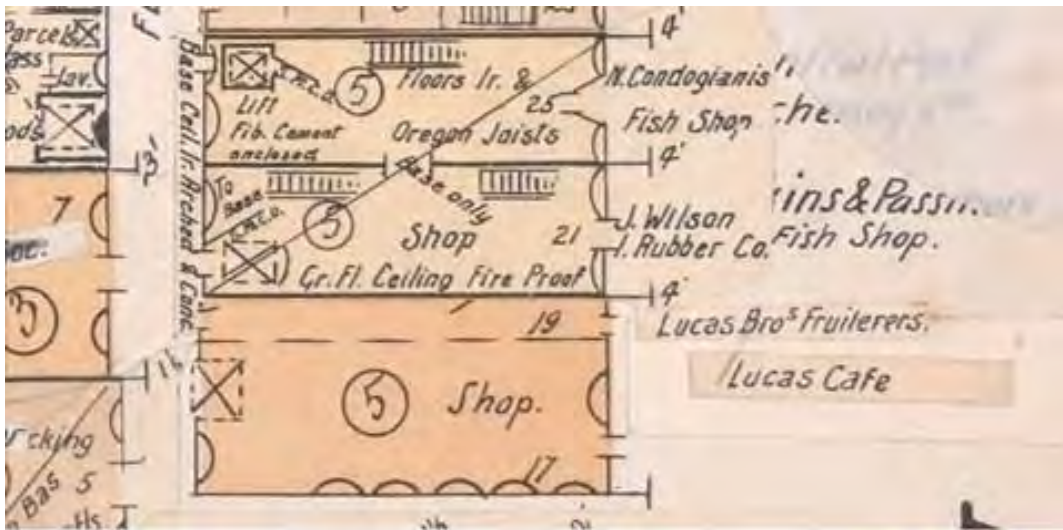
Detail from 1910 Mahlsted plan shows Lucas Bros occupying the property, as well as added detail on some of the building features, i.e. shop front with two entrances, five window openings on the southern elevation, two rear door openings and an internal lift well. (Source: Mahlsted Map, no 15, 1910)
